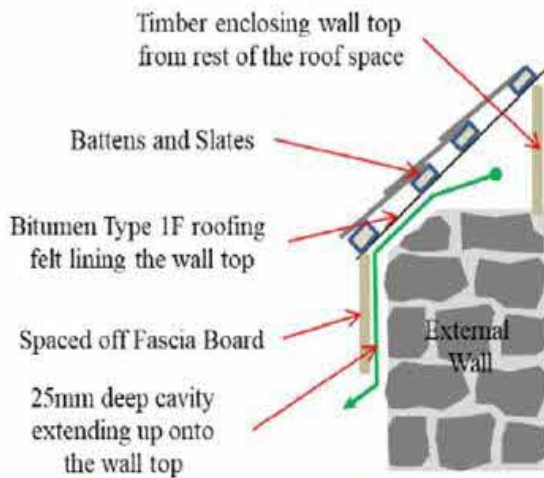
Diagram demonstrating access to wall tops for crevice dwelling species.
